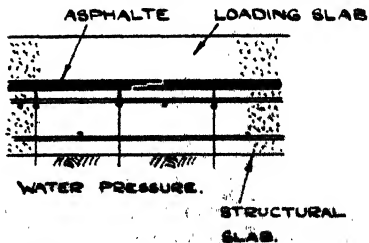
PROVISION OF LIGHT LOADING SLAB OVER ASPHALTE
